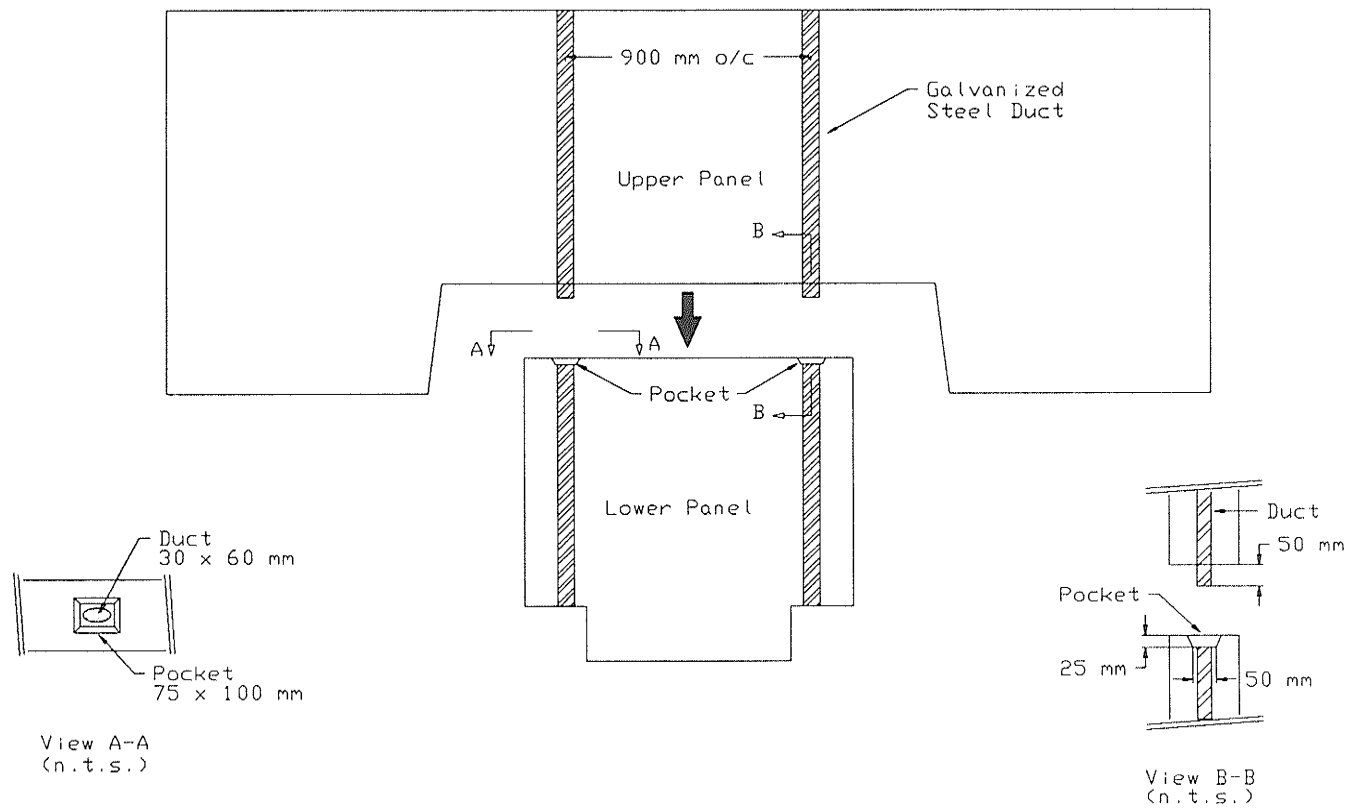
Post-tensioned Specimen Configuration and Connection Assembly Details
